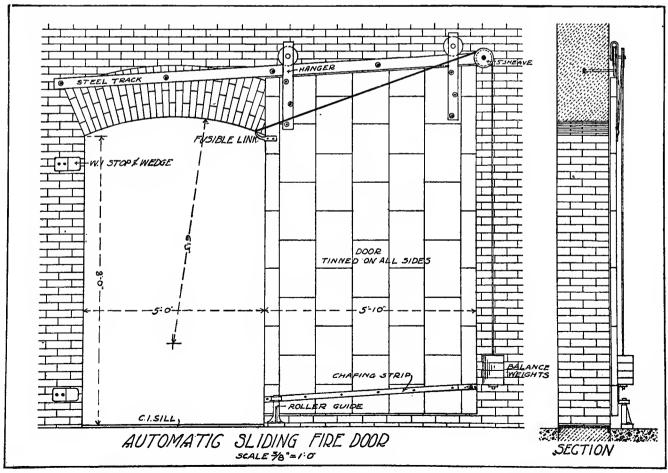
FIRE RESISTING TIMBER FACTORY CONSTRUCTION
